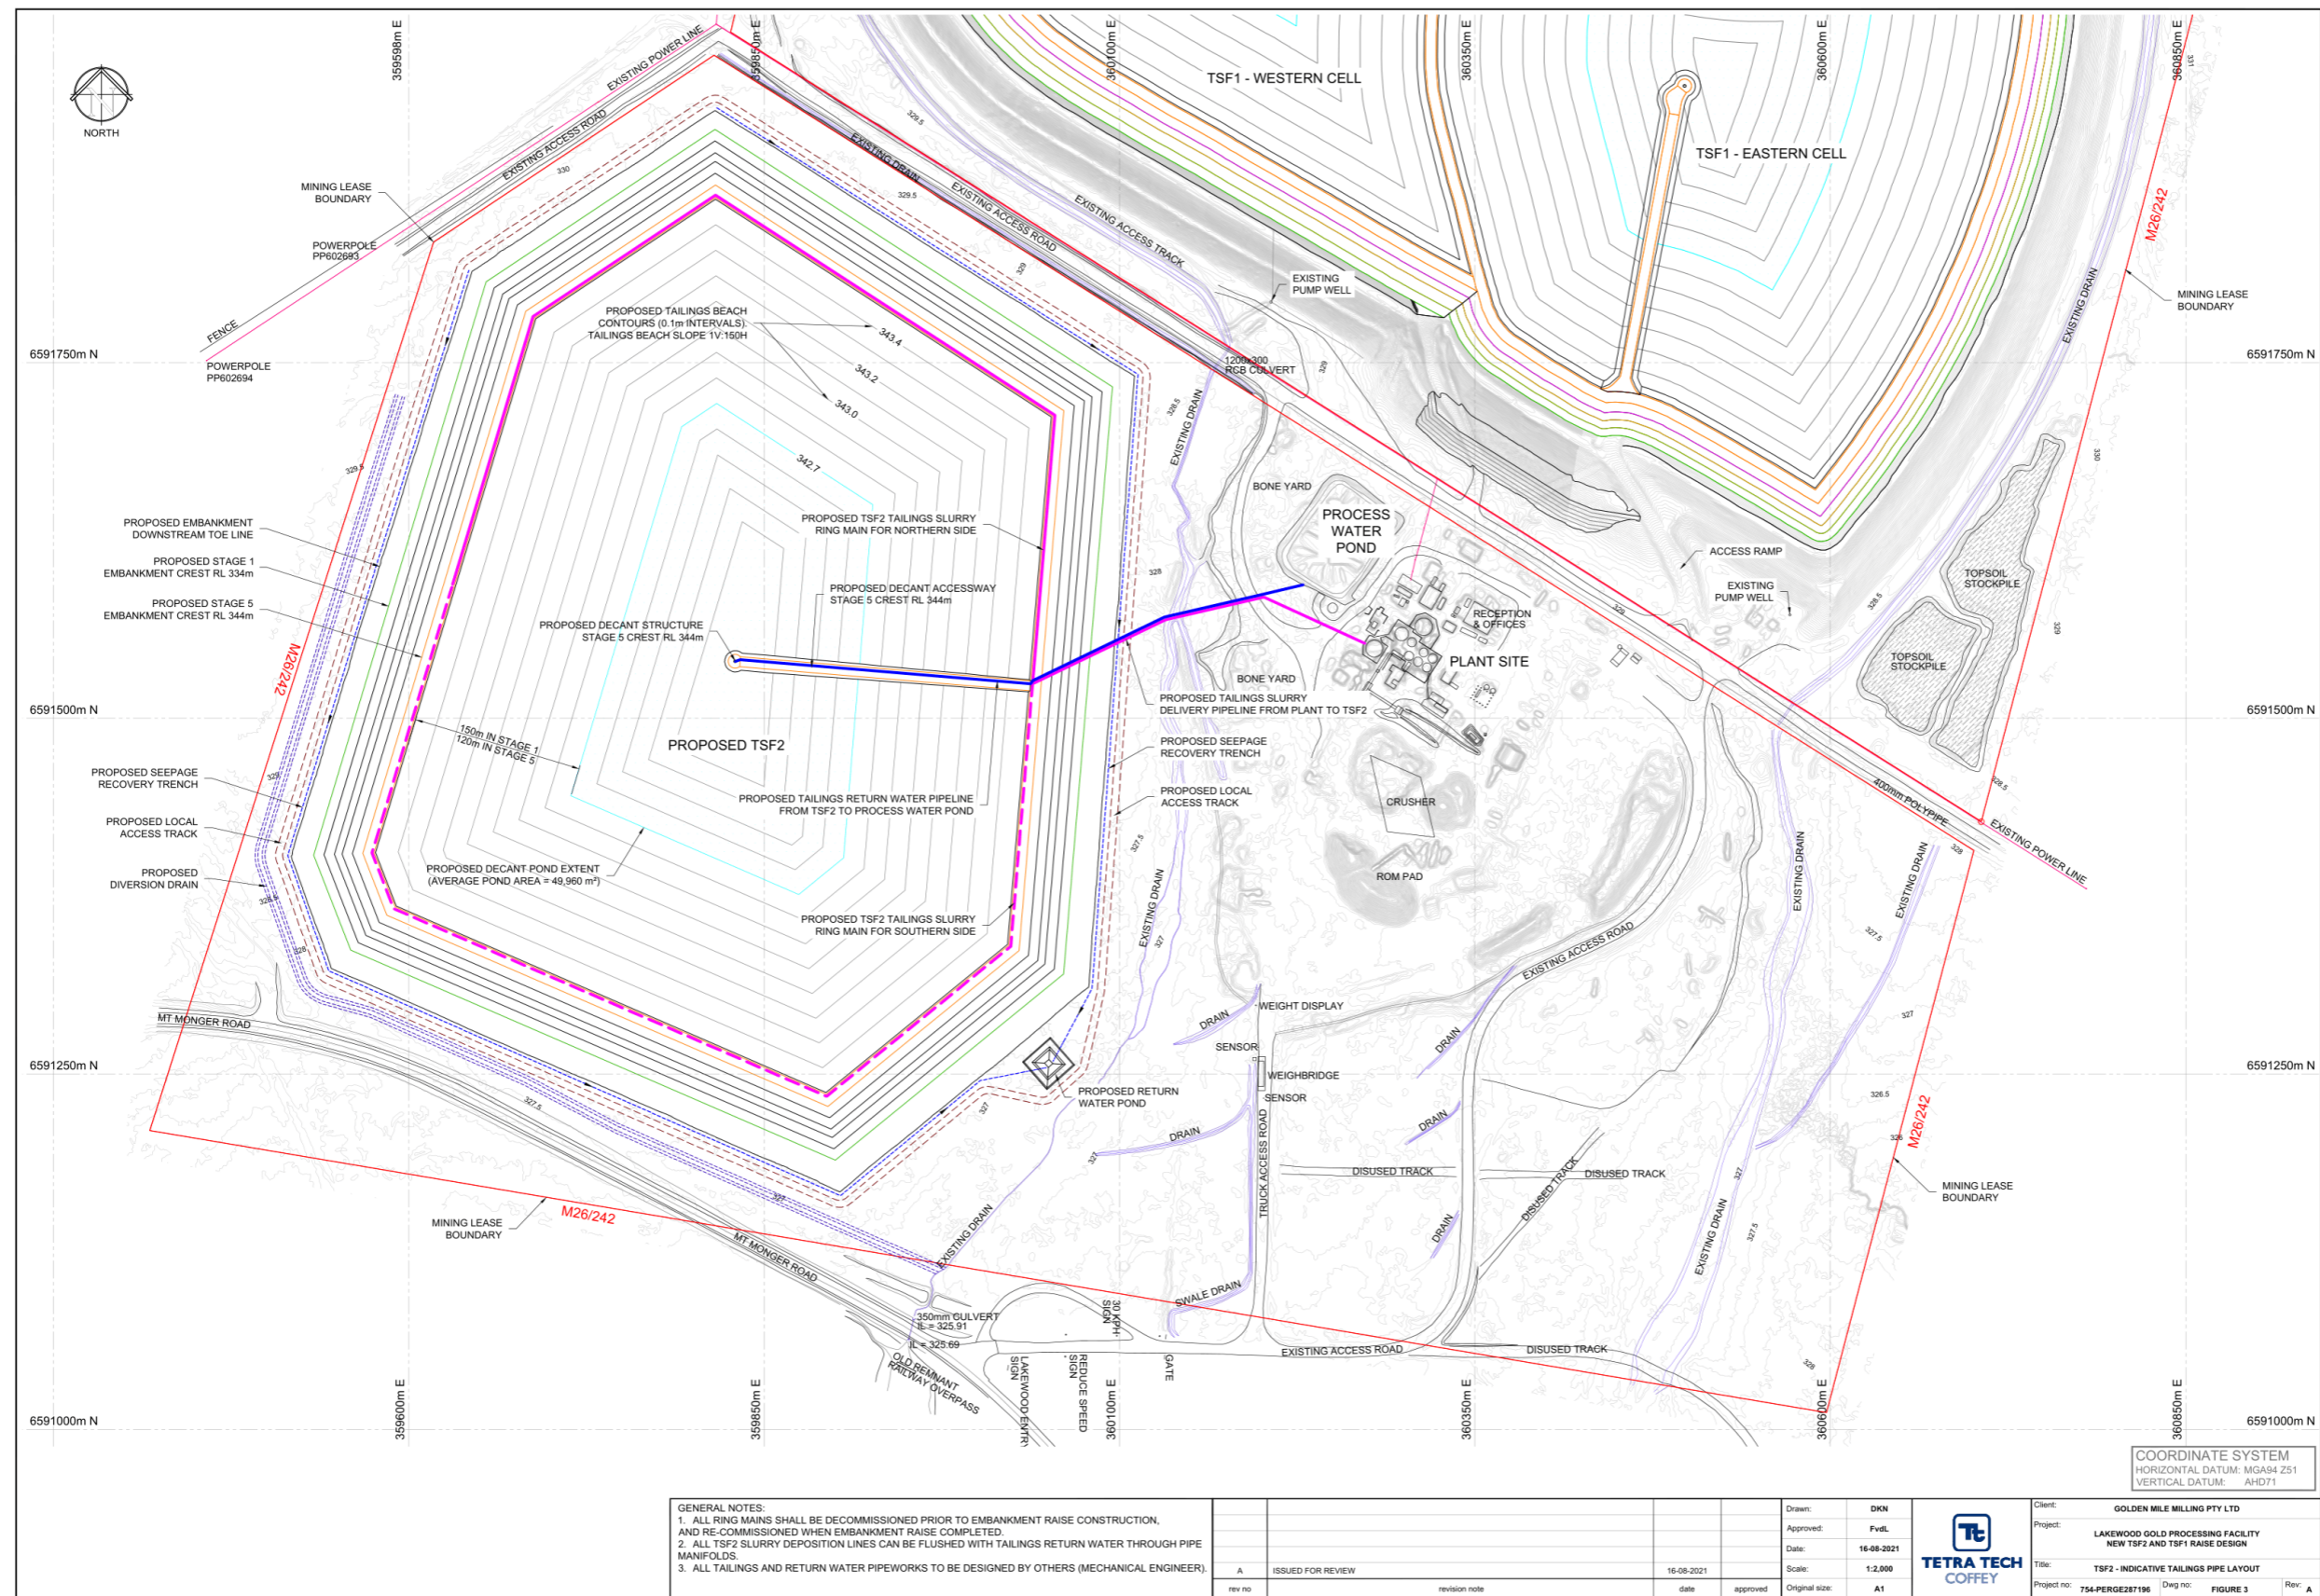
TSF2 – Tailings delivery and return water pipeline layout and construction drawing
